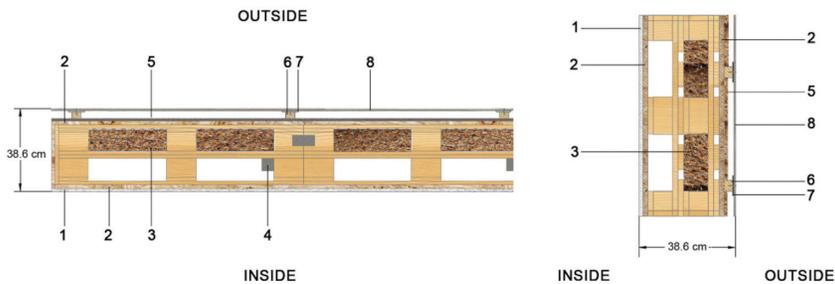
Horizontal and vertical sections of the component made from 2 reused pallet. Placing in the building envelope of the classroom: West and South facing walls, part of East facing wall.
